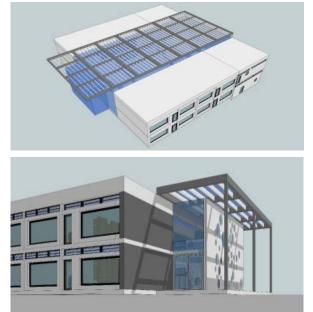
SECOND PROPOSAL OF ROOF FORM.
